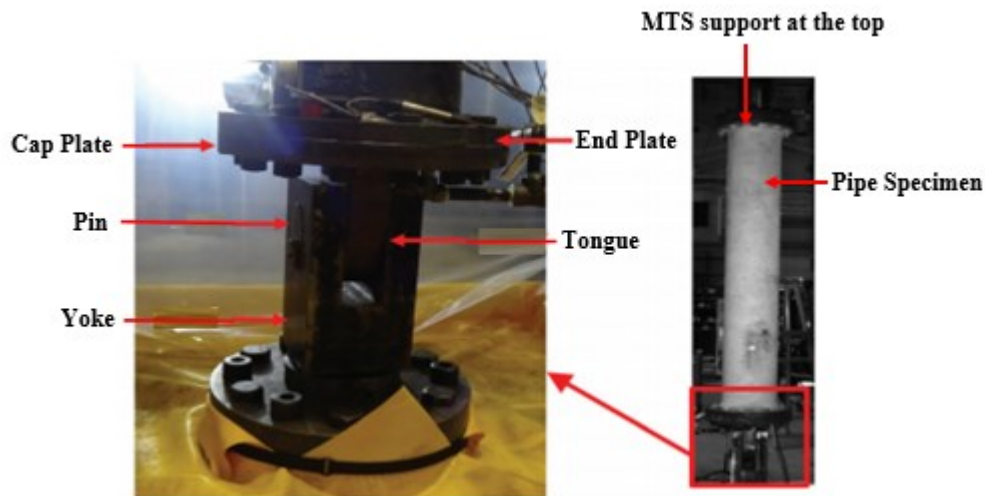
Full-scale test set-up and the details of the loading support. Abdulhameed et al. [8]
